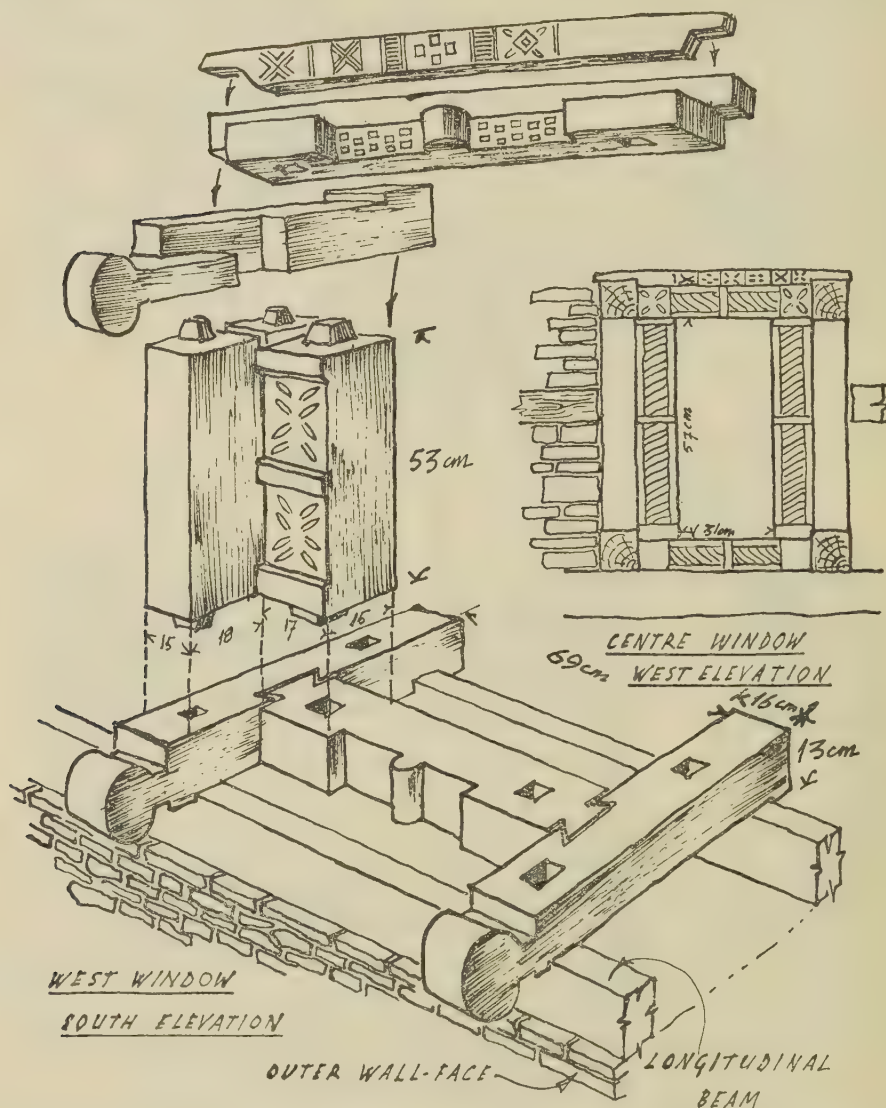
EXPLODED VIEW OF A WINDOW IN SOUTH WALL SHOWING CONSTRUCTION AND DECORATION, AND ELEVATION OF THE CENTRE WINDOW OF SOUTH ELEVATION
